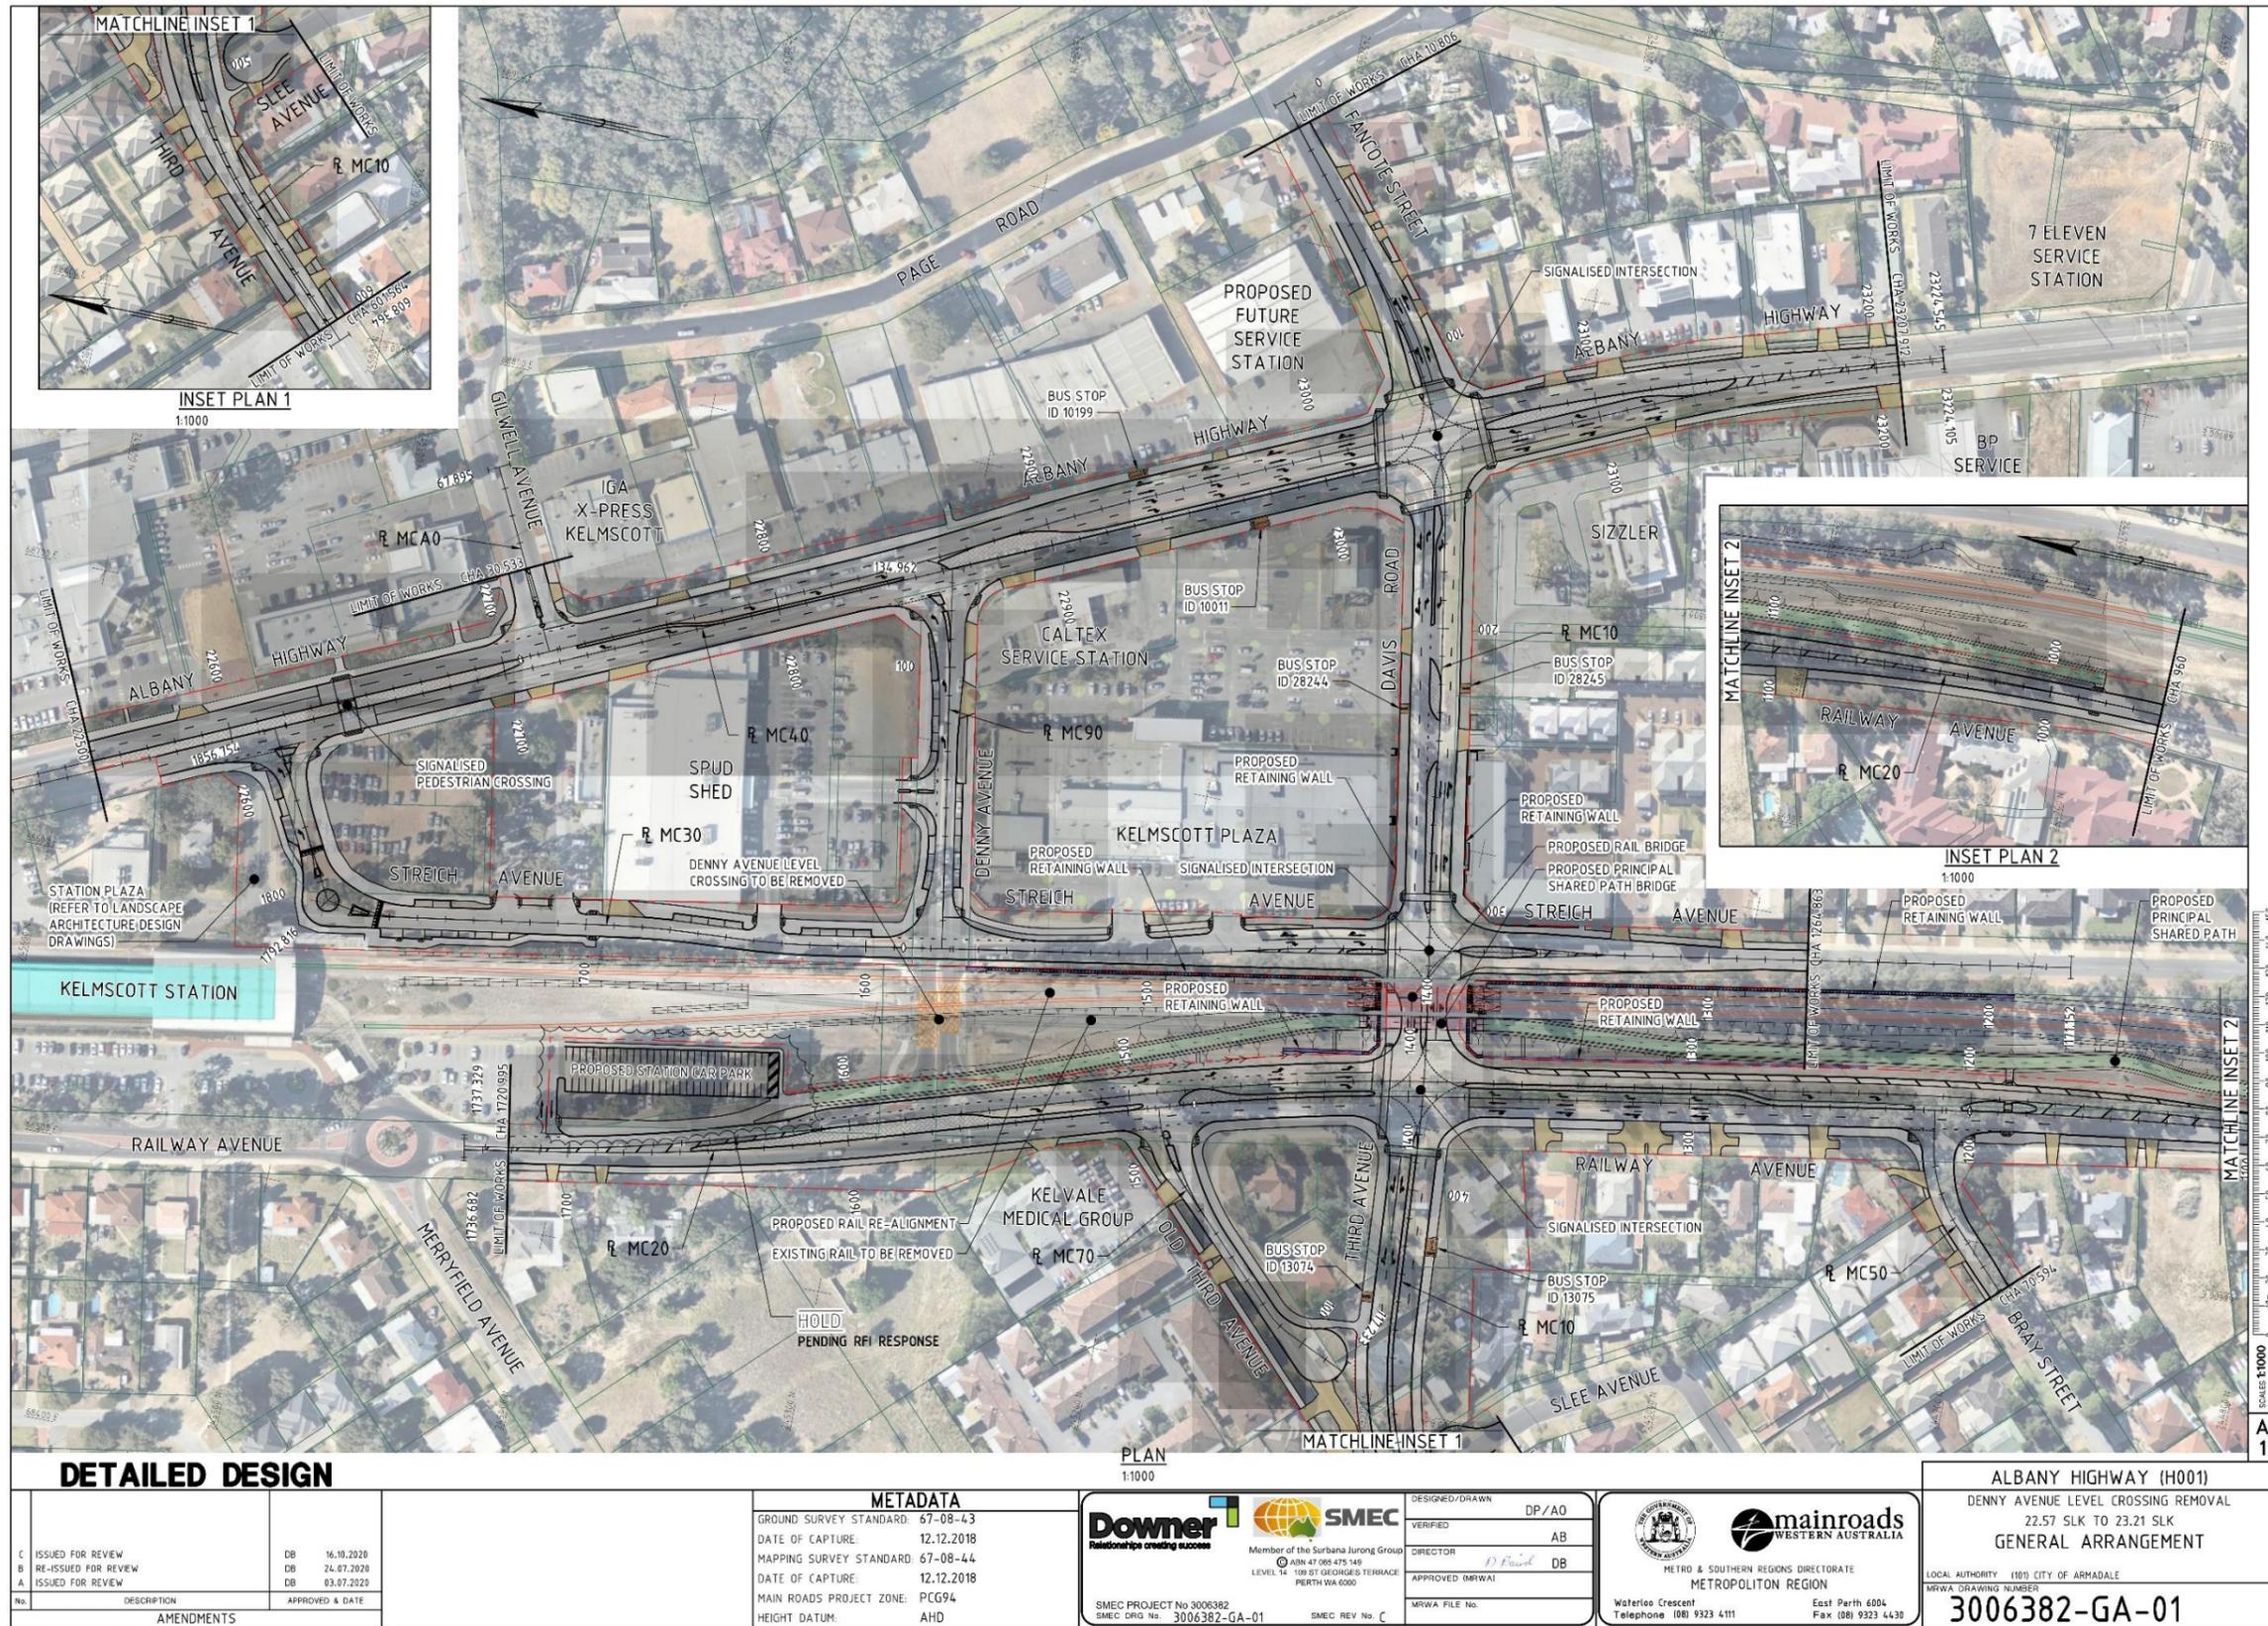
Denny Avenue Level Crossing Removal Project – General Arrangement Plan (source: METRONET / Main Roads WA)
